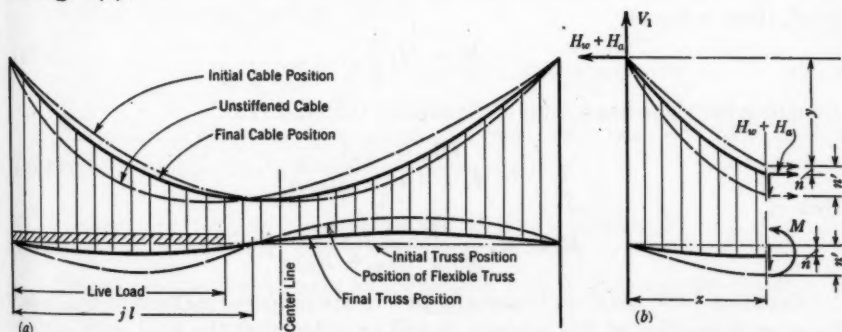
DEFLECTION OF CABLE AND STIFFENING TRUSS UNDER PARTIAL LIVE LOAD
